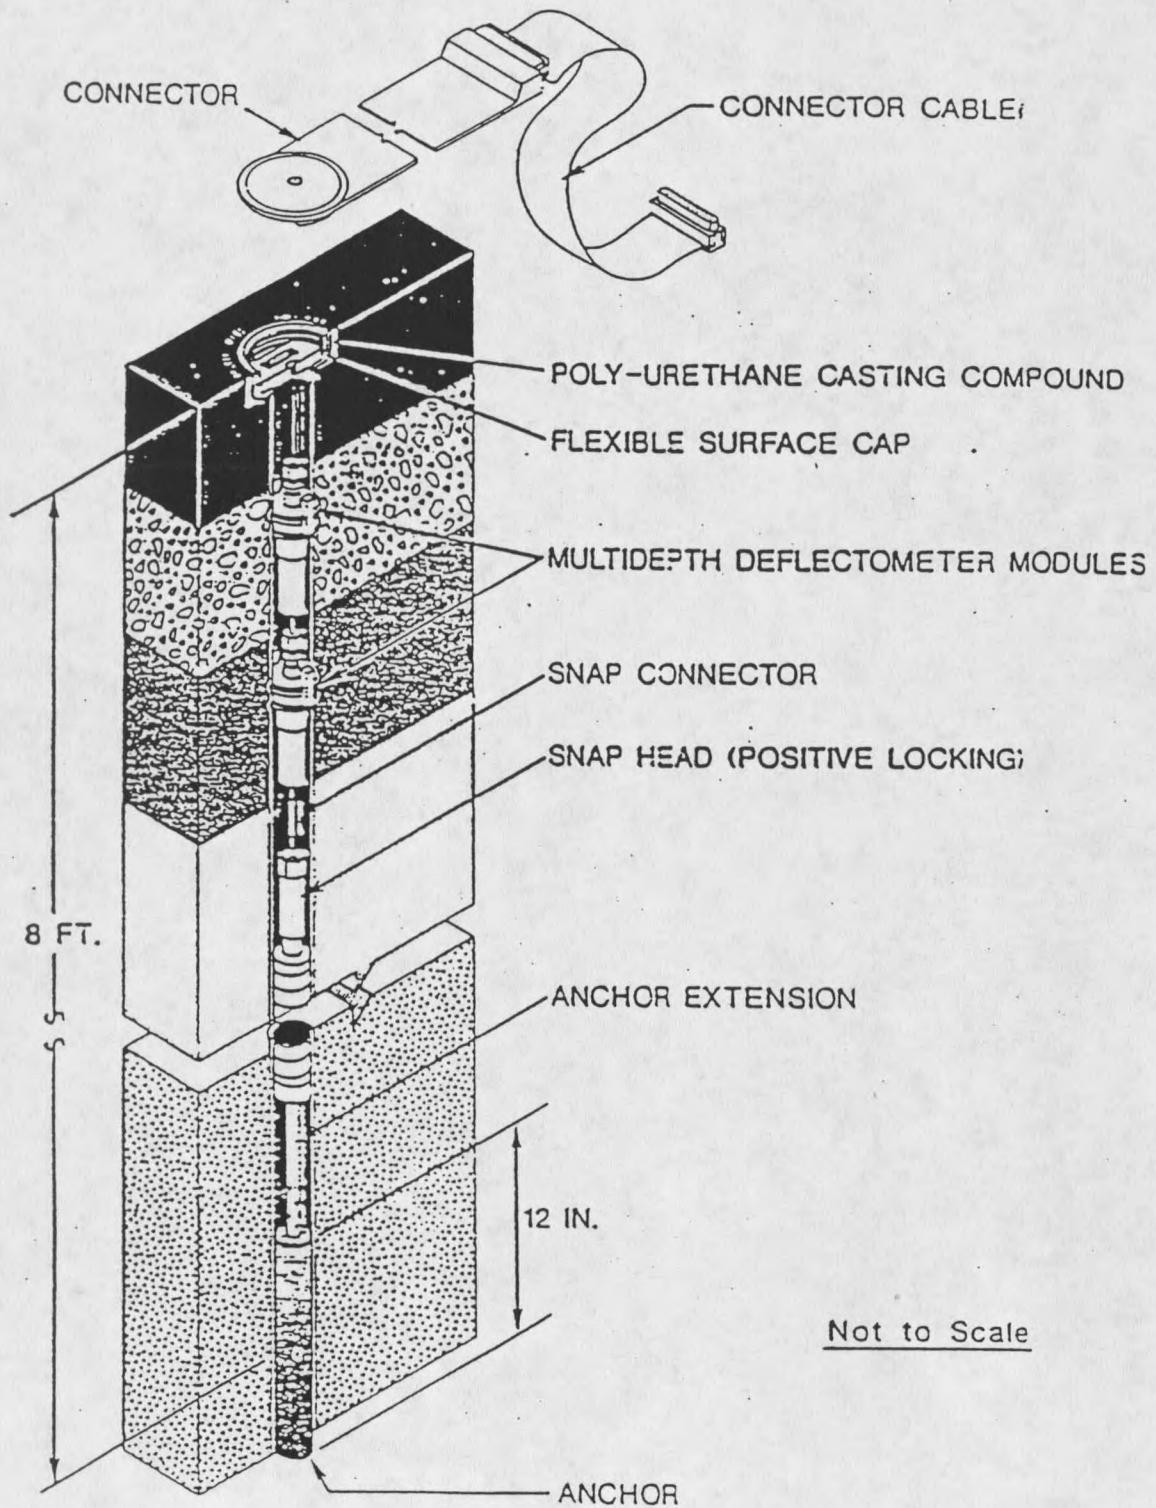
Cross section of a MDD after installation (from Pilson, 1995)
